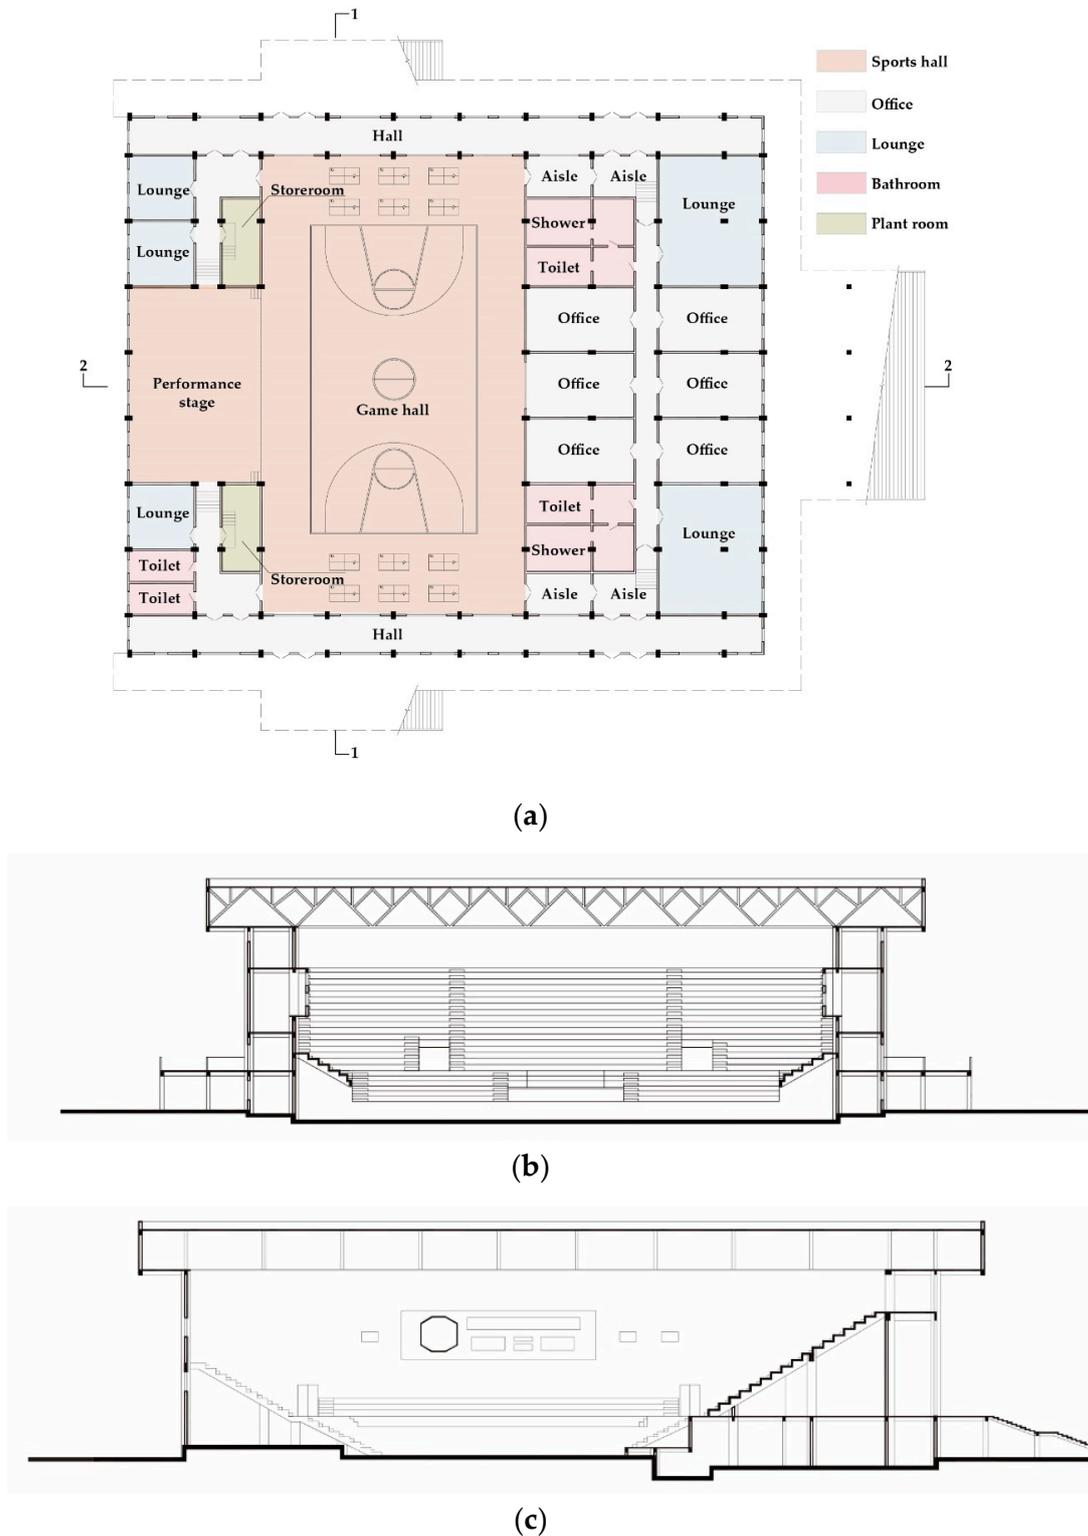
(a) First floor plan of the building. (b) 1-1 Section of the building. (c) 2-2 Section of the building.
